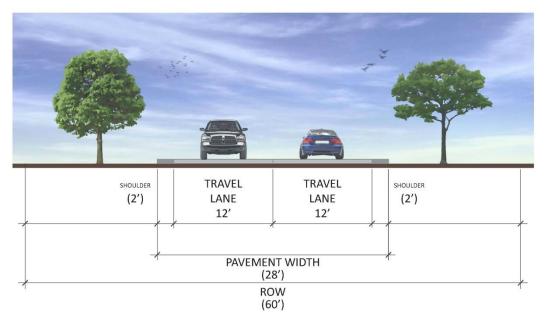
Rural Major and Minor Collector Street Cross-Section
